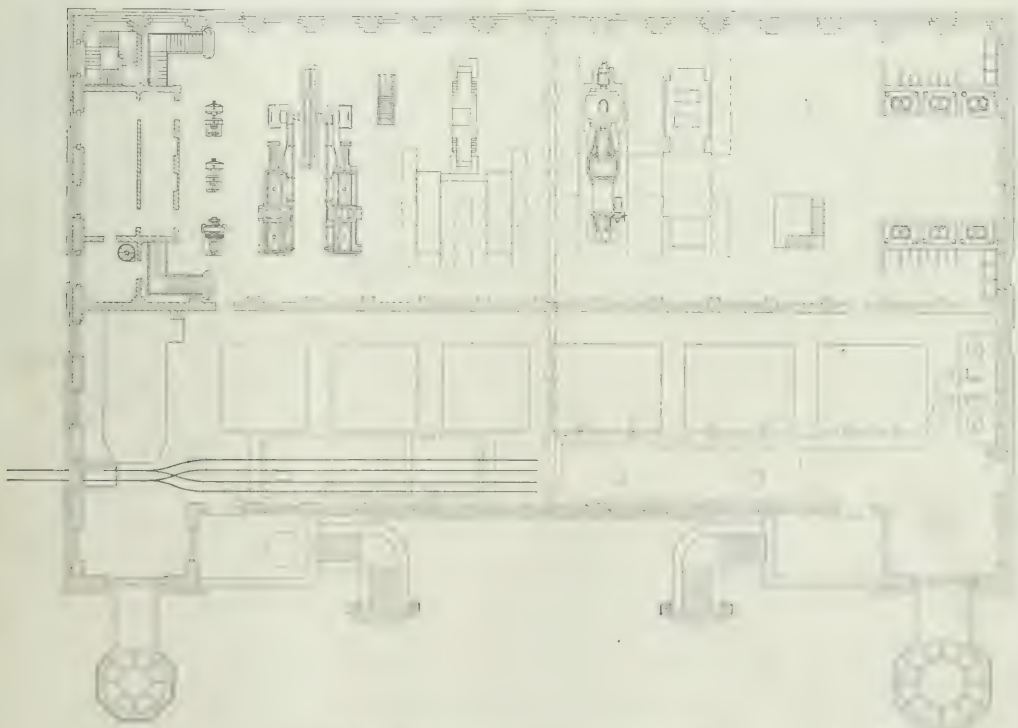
PLAN VIEW OF CASTELLANZA POWER HOUSE.
